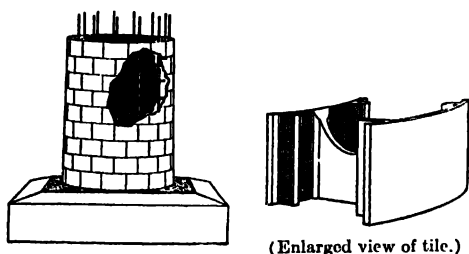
Manner of construction of a reinforced concrete and hollow clay tile chimney.
